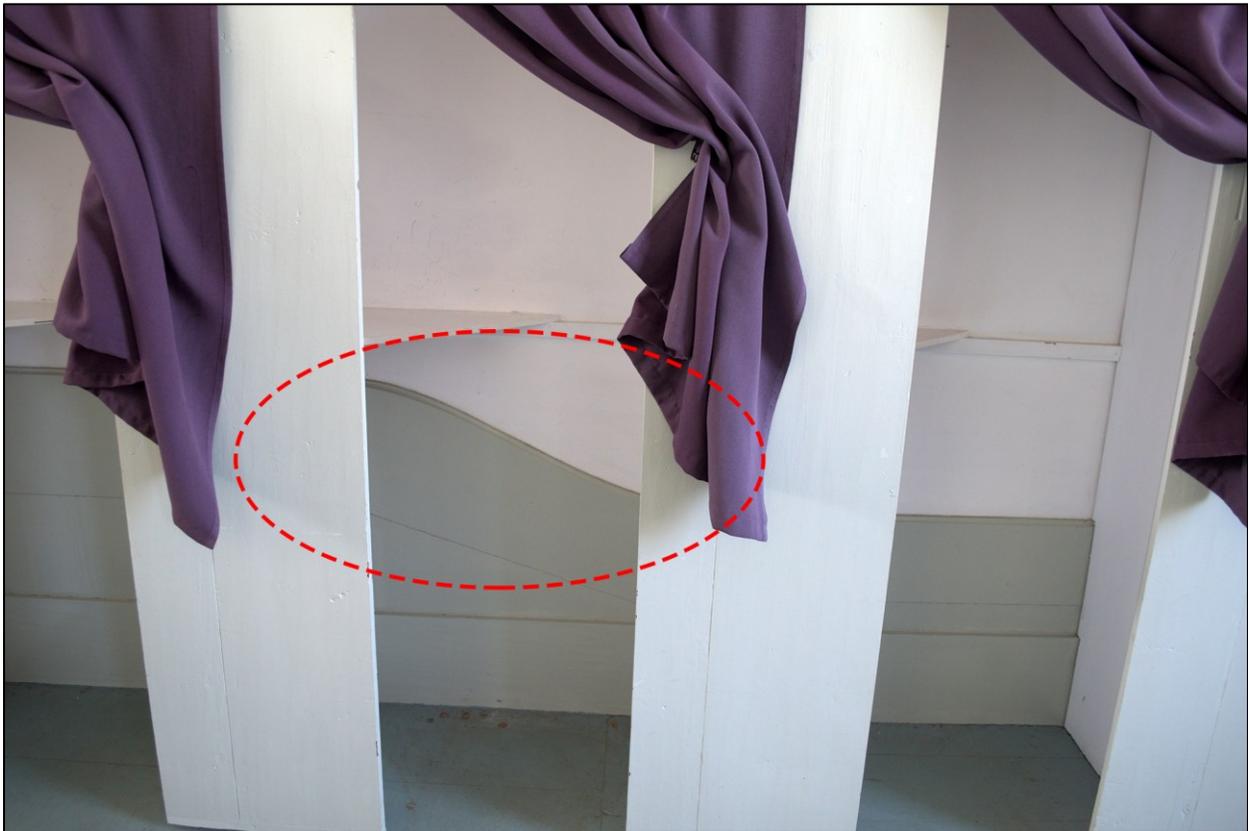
Wainscot detail at south wall, behind later built-in voting booths.
